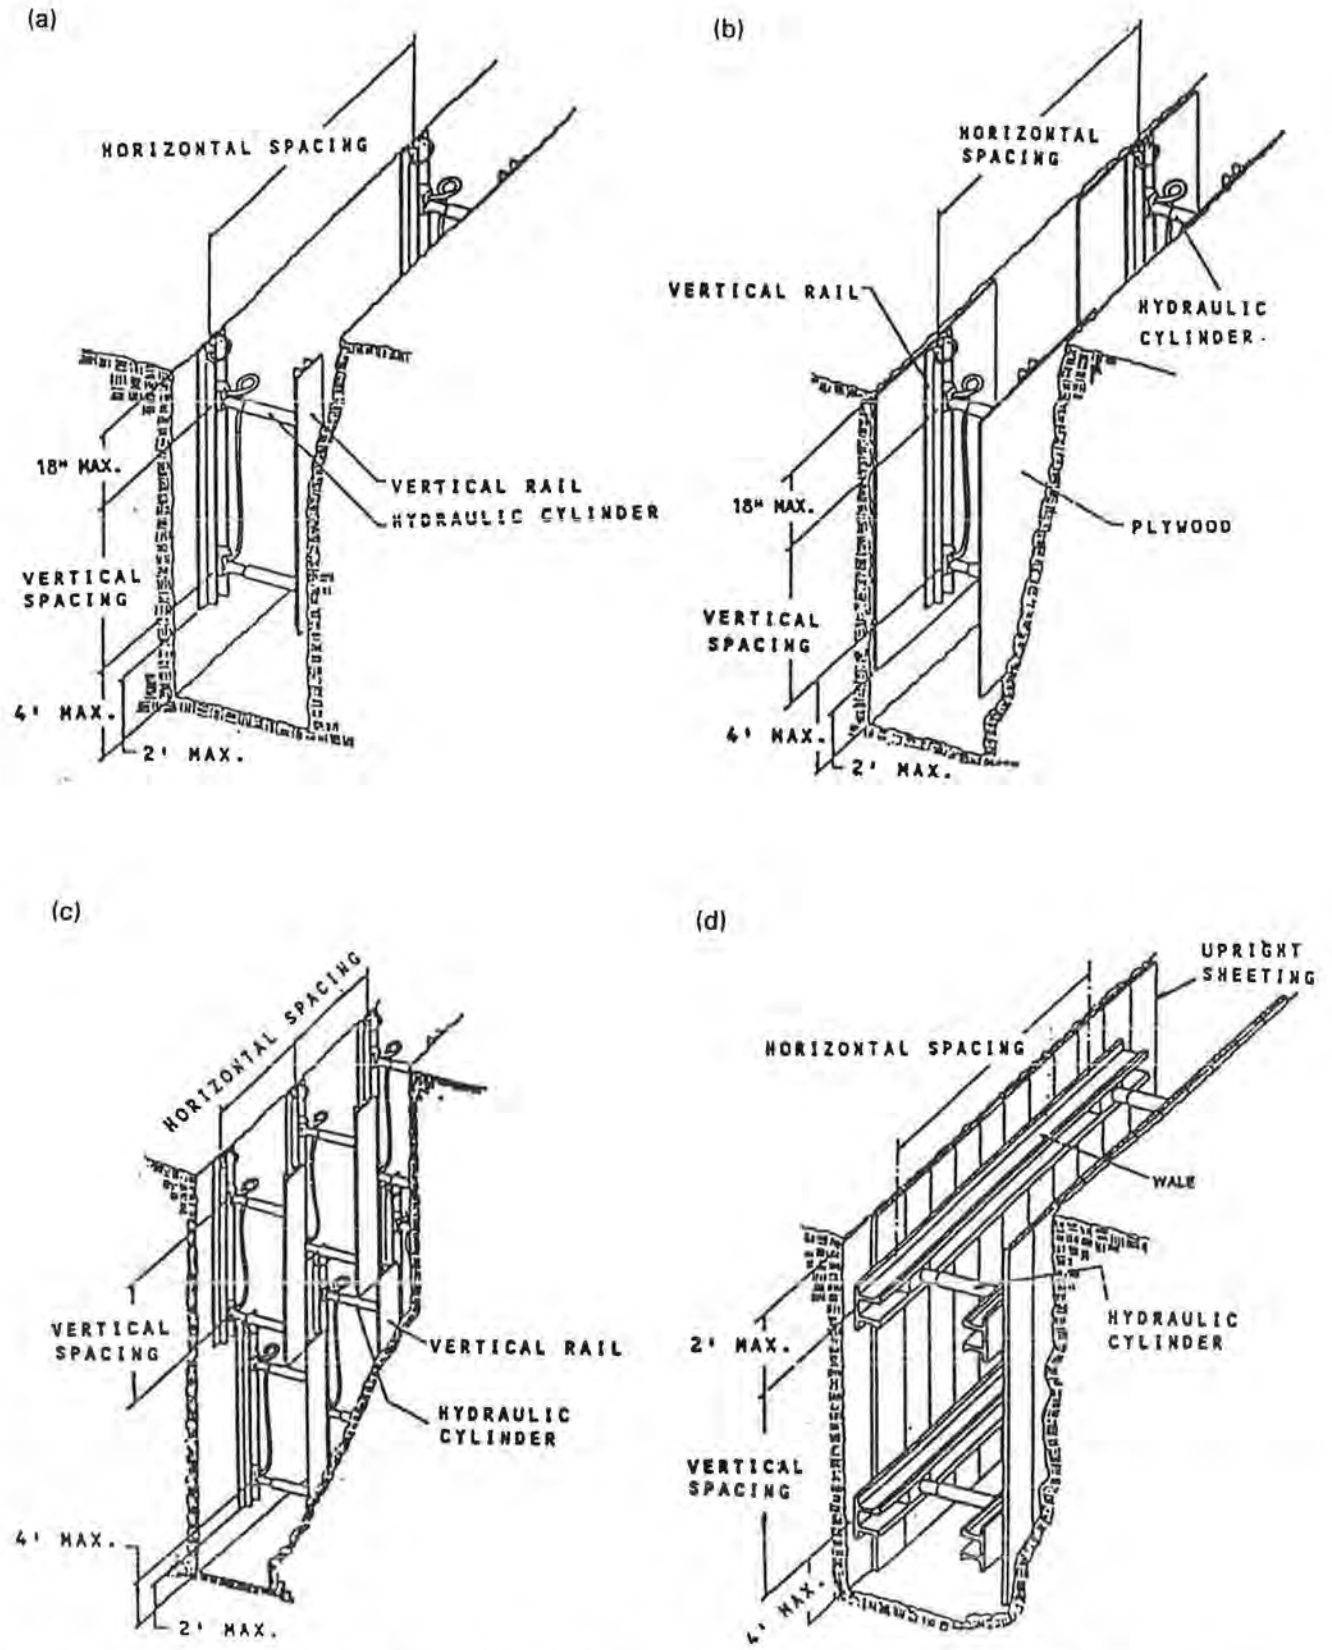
Typical installations of aluminum hydraulic shoring: (a) vertical shoring (spot bracing), (b) vertical shoring with plywood, (c) vertical shoring (stacked), (d) typical wale system.
